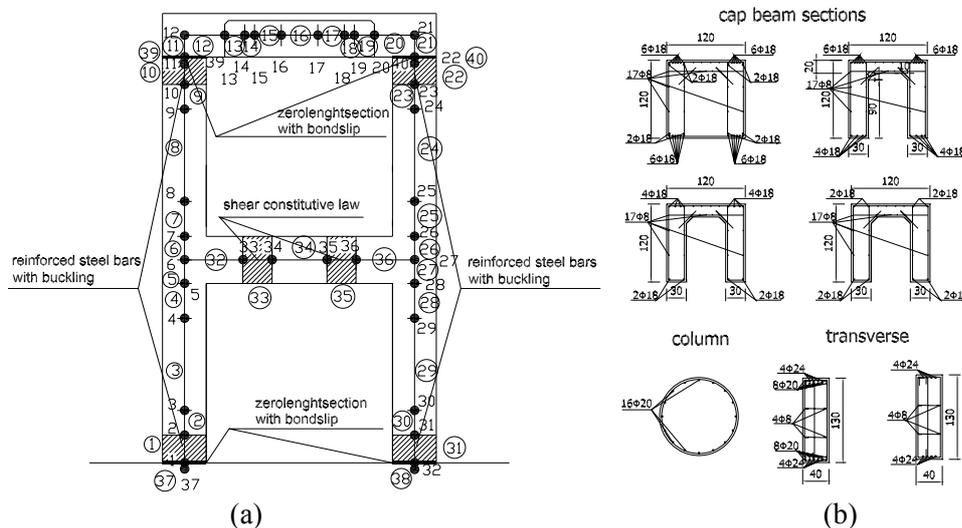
(a) Finite element model scheme. (b) Element sections (actual dimension and reinforcing steel).
